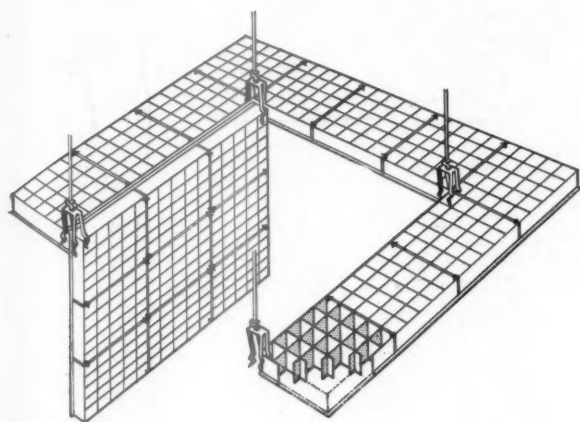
A Harris & Sheldon Luvetile honeycomb-type fitting with hinged suspension
